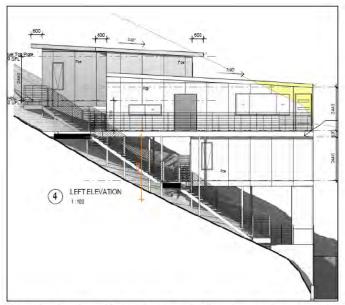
Southern elevation plan, with the yellow area identifying the area above the 9m height limit
